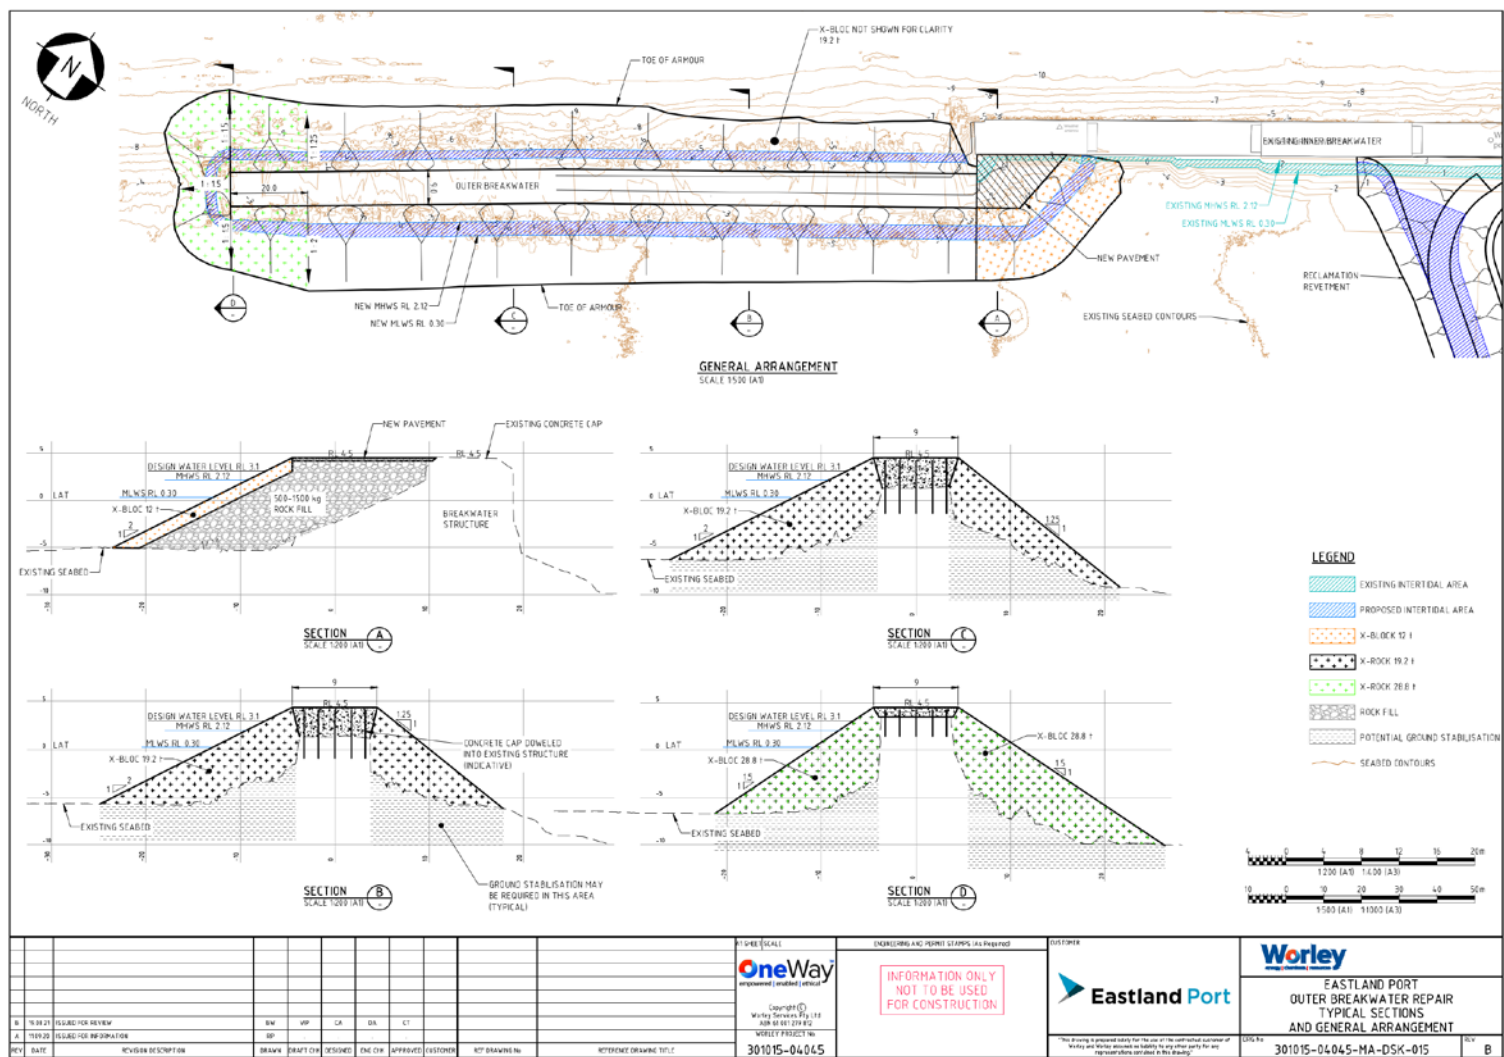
Eastland Port Outer Breakwater Repair Typical Sections and General Arrangement
